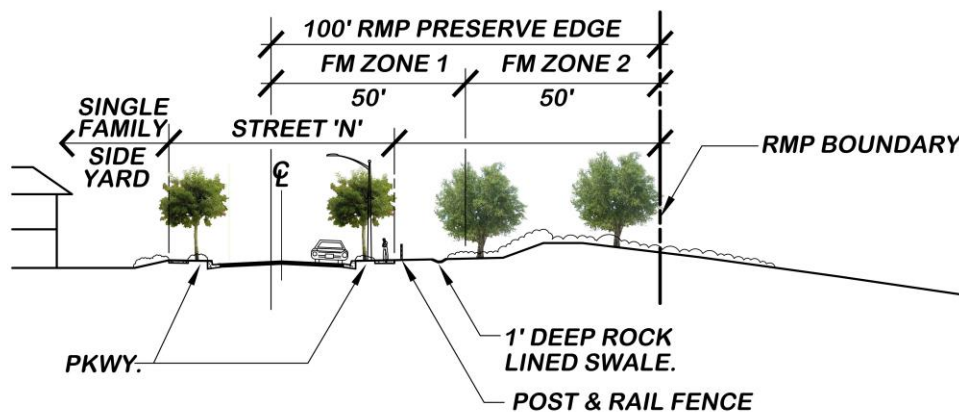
Typical Condition 6 – Perimeter Slope * Street “N” @ Single Family R-1
